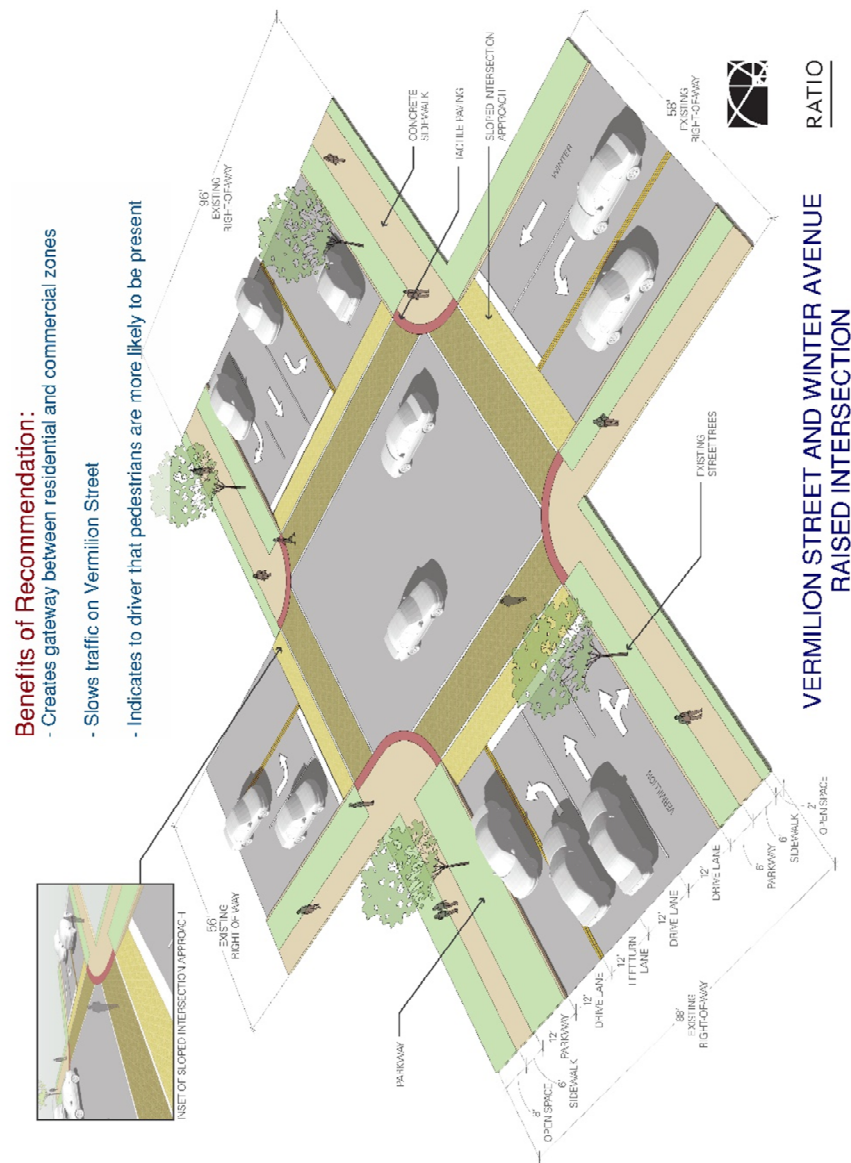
Vermilion Street and Winter Avenue Raised Intersection
